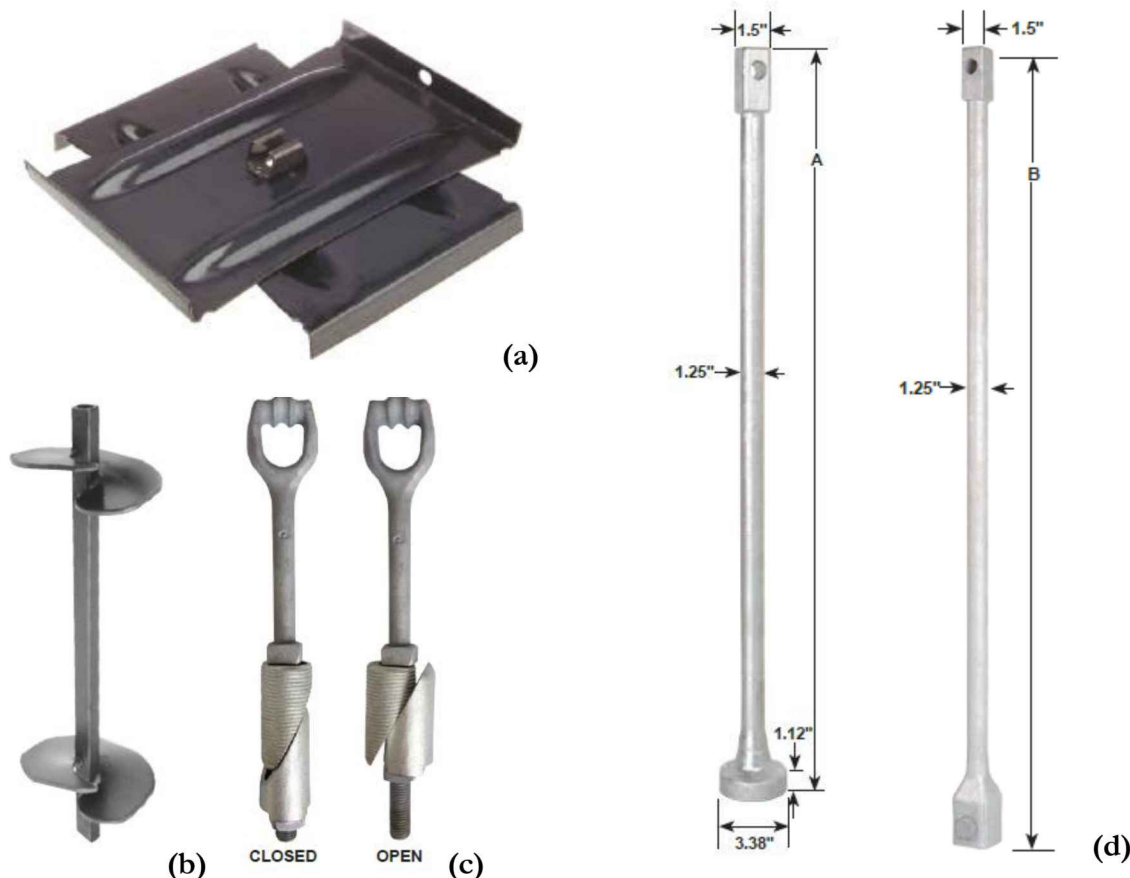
Anchor types (CHANCE, n.d.). (a) Cross-steel Plate; (b) Helix Anchors; (c) Expanding Rock Anchors; (d) Grouted Rock Anchors.
